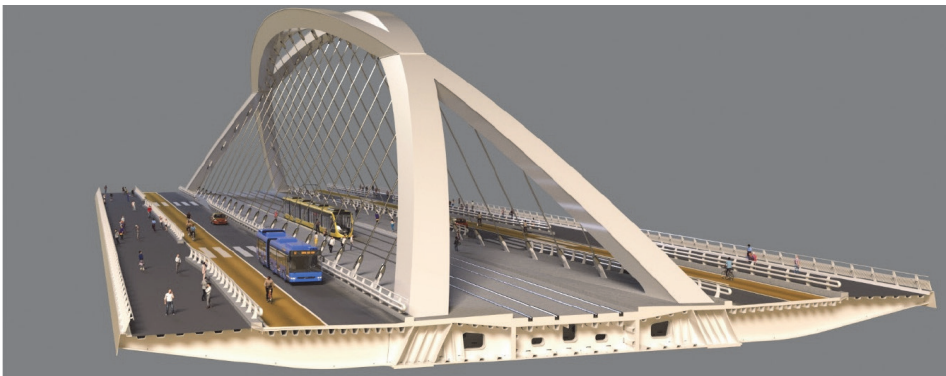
The proposed section of the new bridge accommodates space for pedestrian, cycle, road and tram connections [2]
